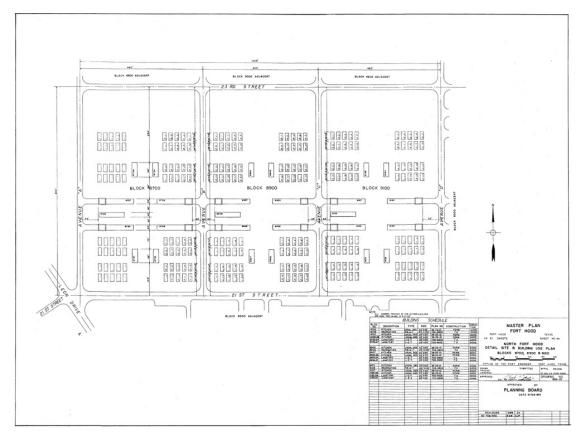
Proposed plan of three blocks of "Tent City" from 1953 "North Fort Hood Detail Site and Building Use Plan" (Fort Hood).
